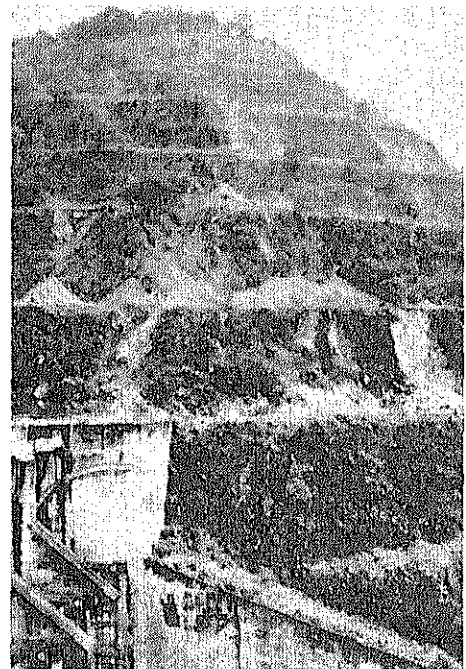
Collapse of the cutting slope on the spillway of the Binga Dam
